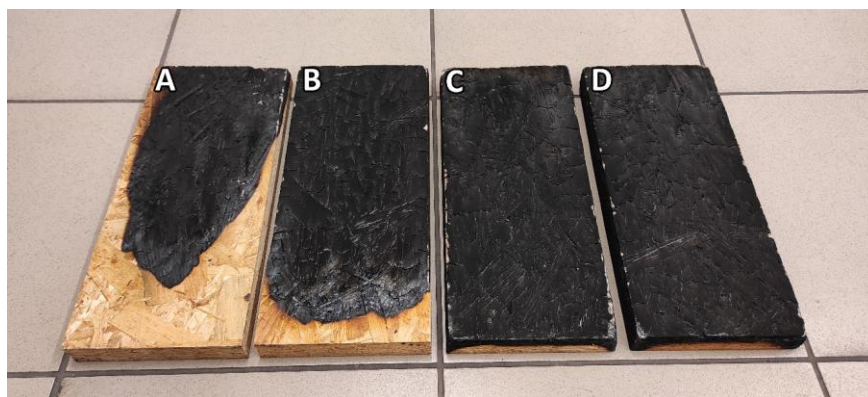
Samples after the end of measurements at burner outputs of: A – 2 kW, B – 3 kW, C – 4 kW, D – 5 kW.
